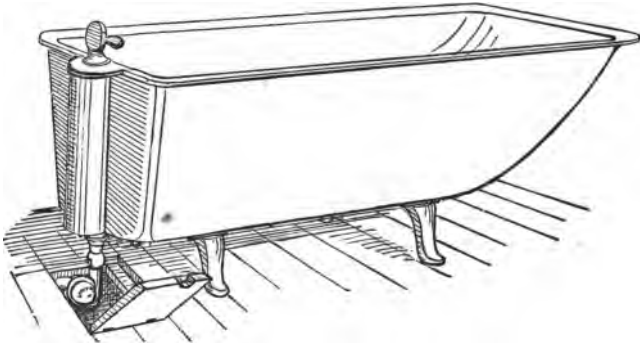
Enameled Iron Tub set "open," showing means of access to a trap set between the floor joists.
